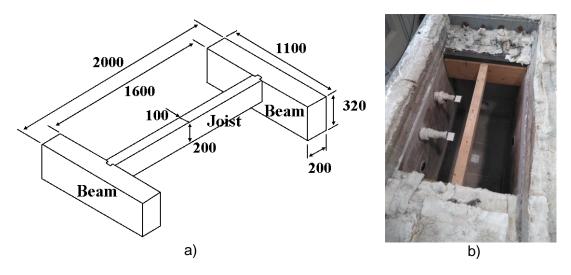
a) Dimensions of the specimen in mm. b) Specimen assembly inside the furnace.
